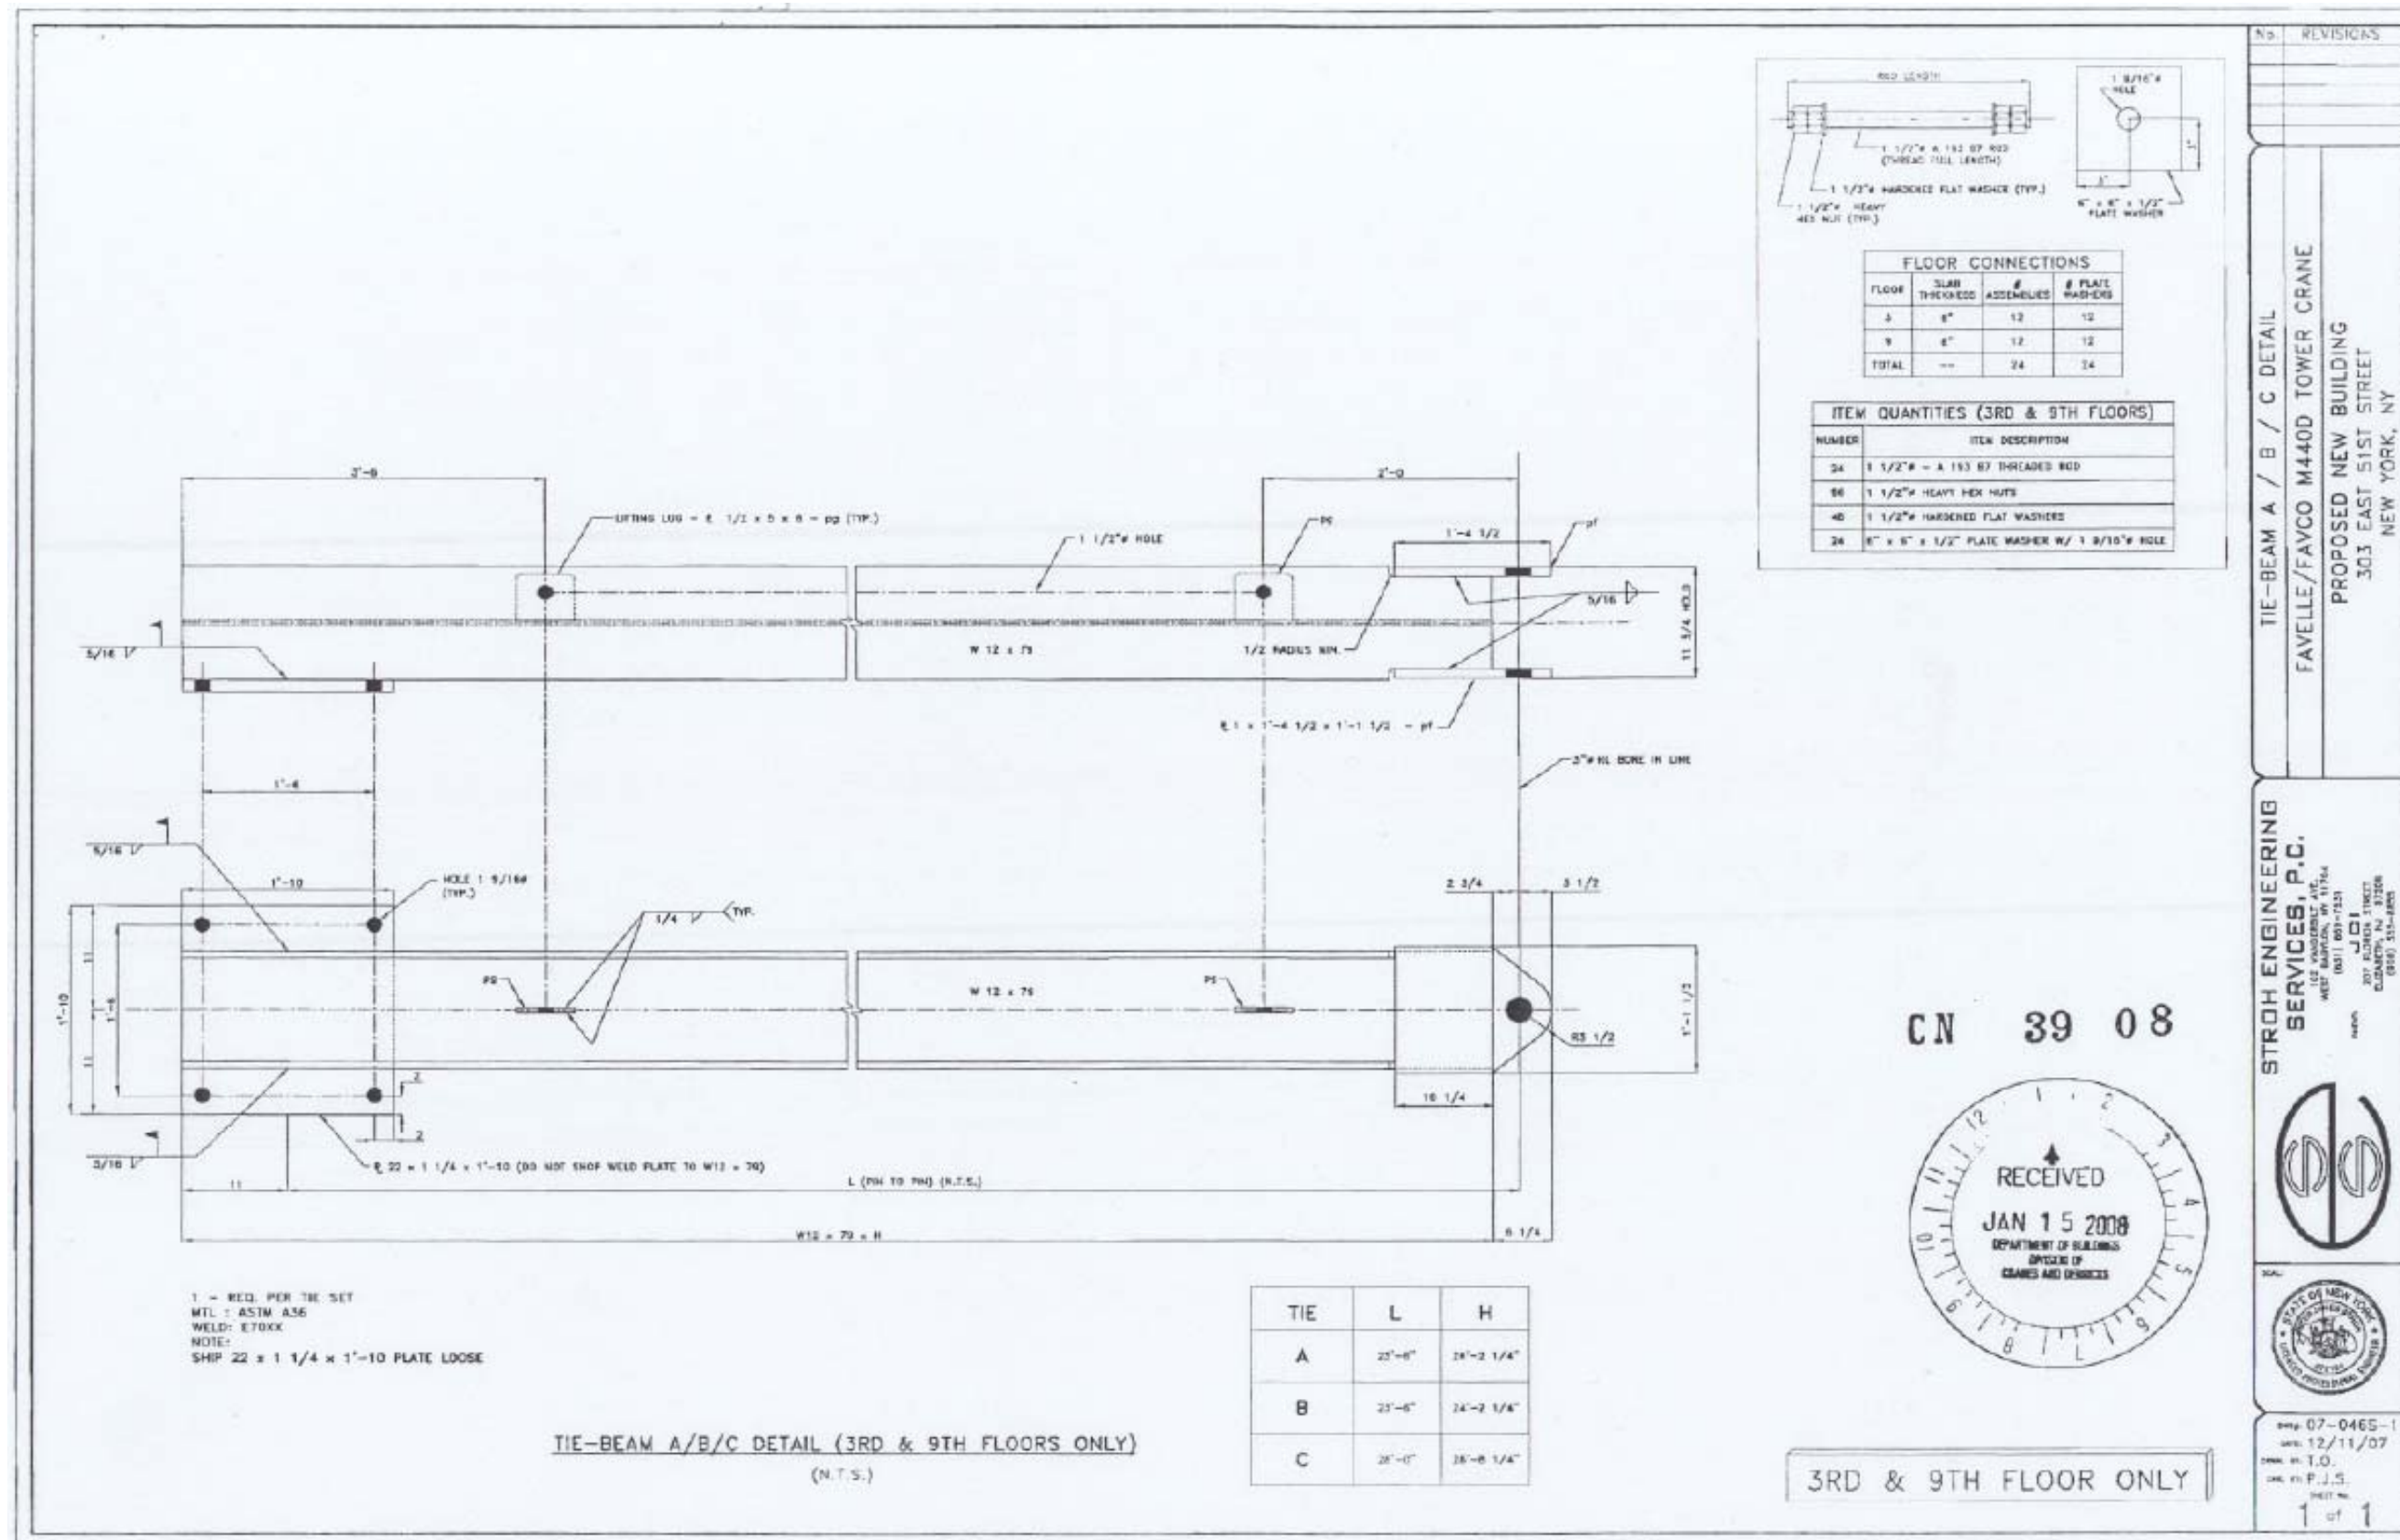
Tie-Beam A, B & C Detail. Provided by the crane engineer Stroh Engineering, drawing 07-046S-1 sheet 1 of 1 dated 12/11/07.
